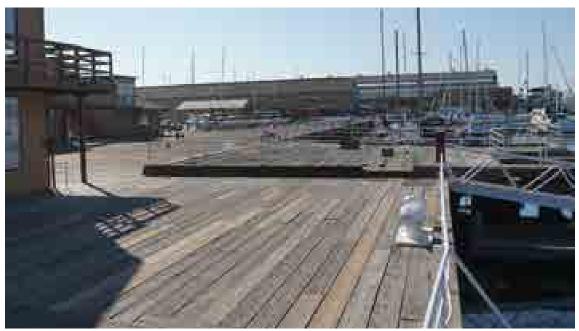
View looking northwest of existing wharf facilities within Alameda Marina.
